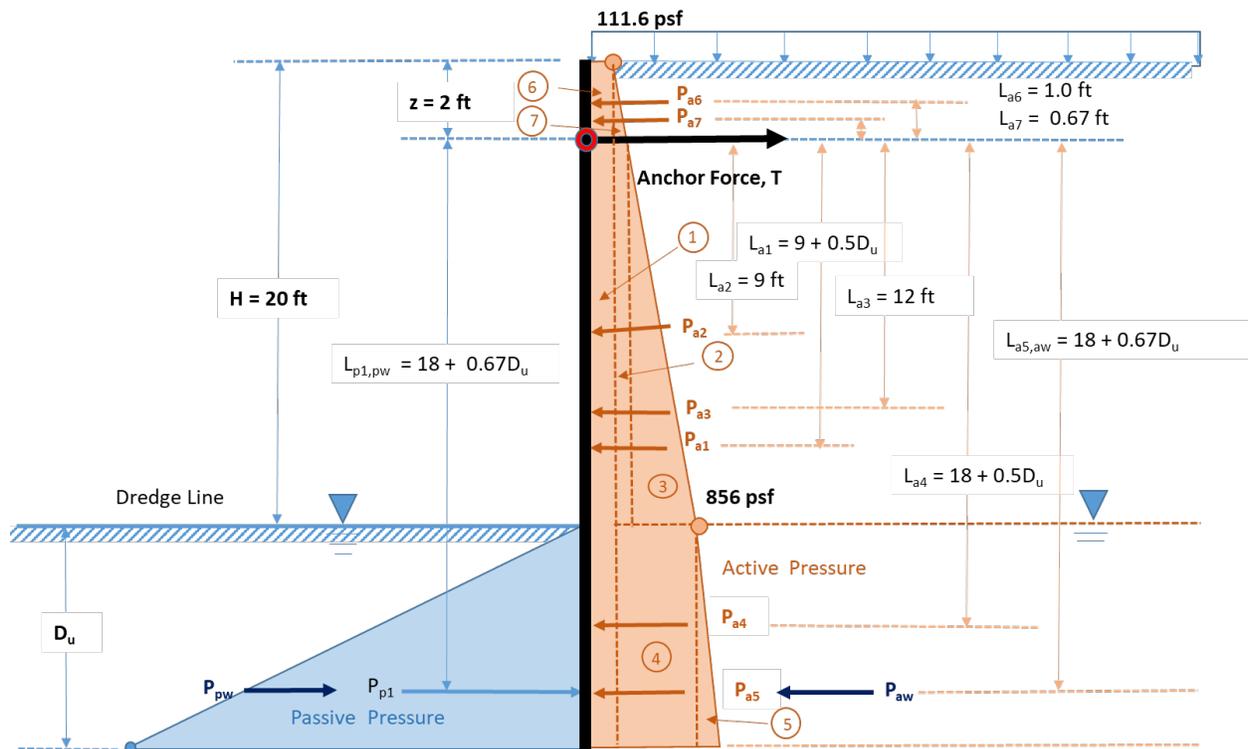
Case 4 Active and passive forces and locations acting on the sheet pile wall as a function of D_u .
